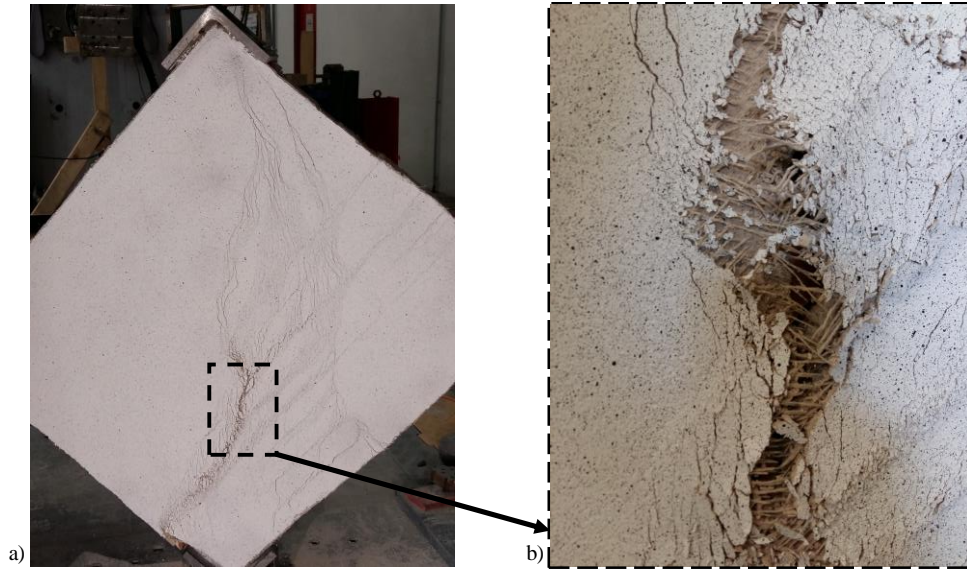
Failure mode: a) specimen SW-2L-3; b) close-up of the textile rupture.
